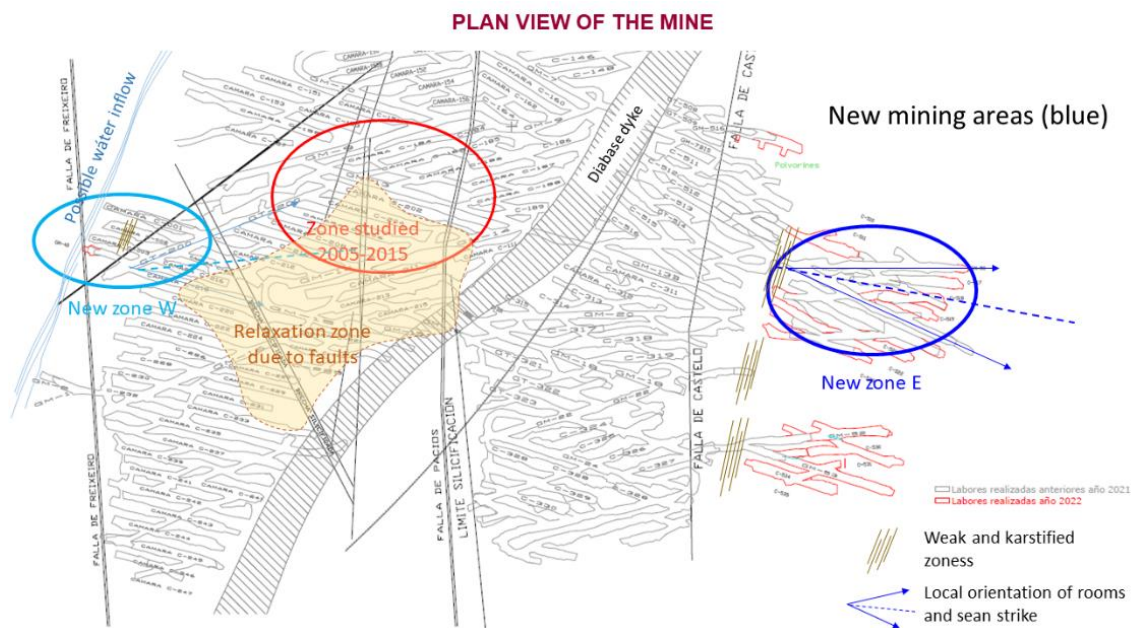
Plan view of the mine showing the relaxation areas associated with faults and the new mining zones at the East (new zone E) and West (new zone W) of the mine.
